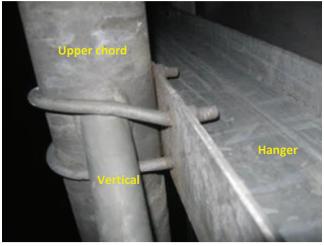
Misaligned and bent U-bolt at hanger to chord connection
